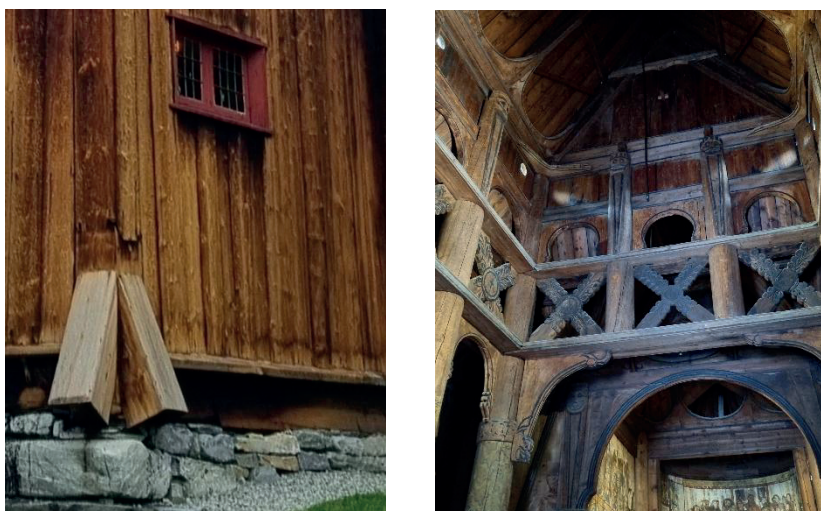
Detail of the building's foundation (left); interior of a stave church (right)
